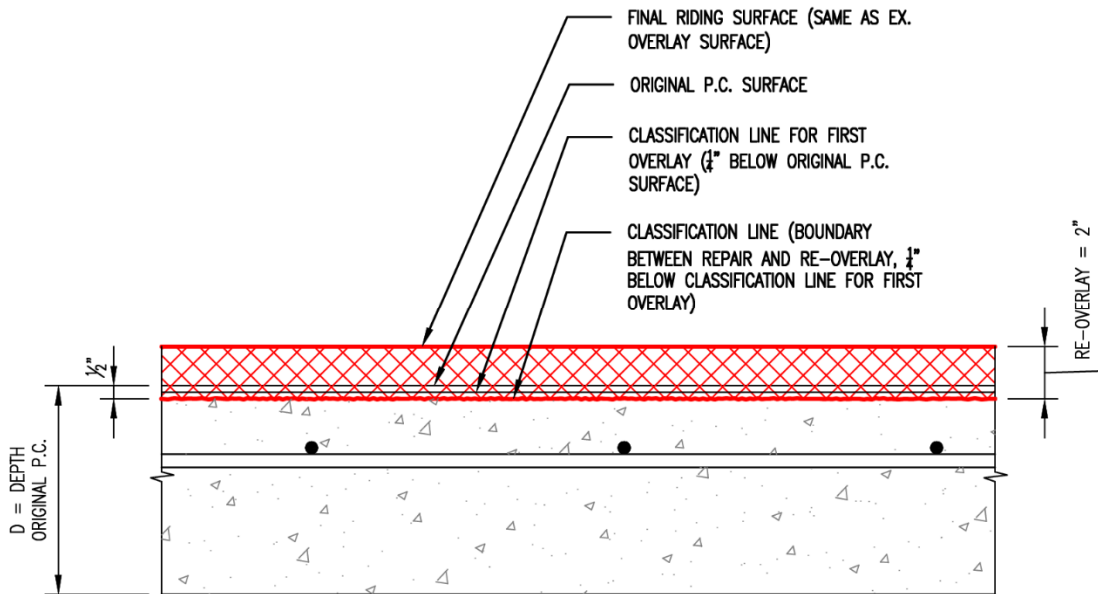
TPO, longitudinal section at a typical location along roadway (section at joint similar)
